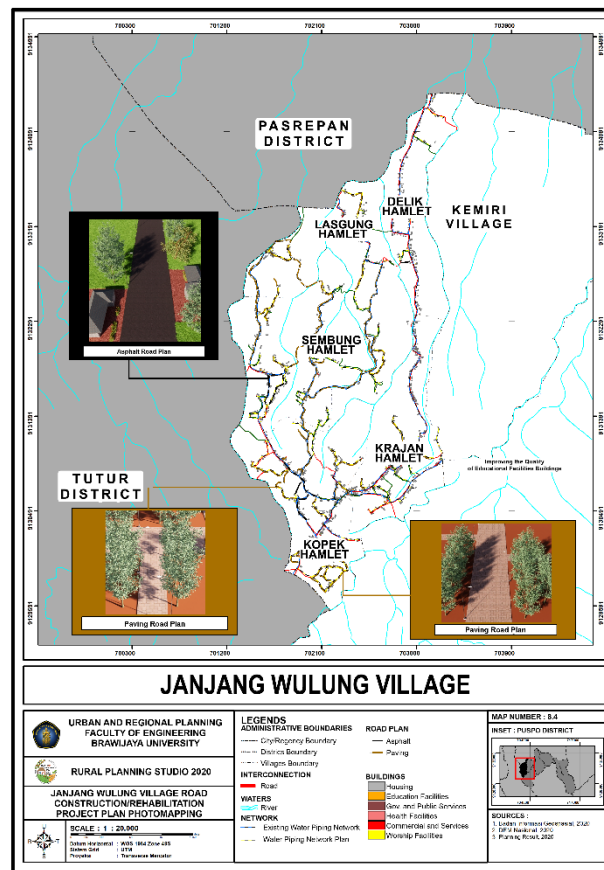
Photo Mapping of the Janjang Wulung Village Road Rehabilitation Project Plan
